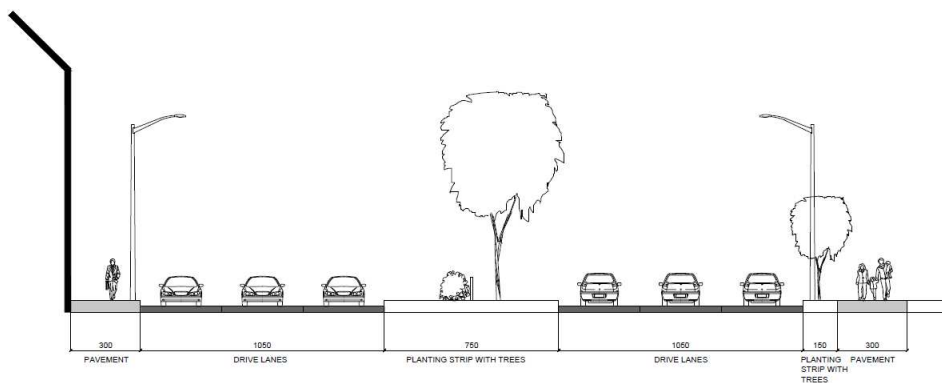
Street section – the national road no. 91 in Zgierz. Source: (Olczak, 2019).
